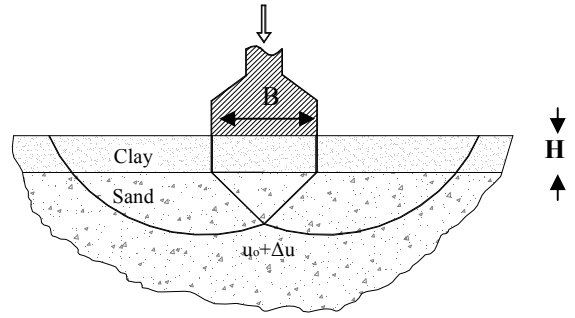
Footing resting on liquefiable sand with a clay cap: failure surface assumed by [3]
